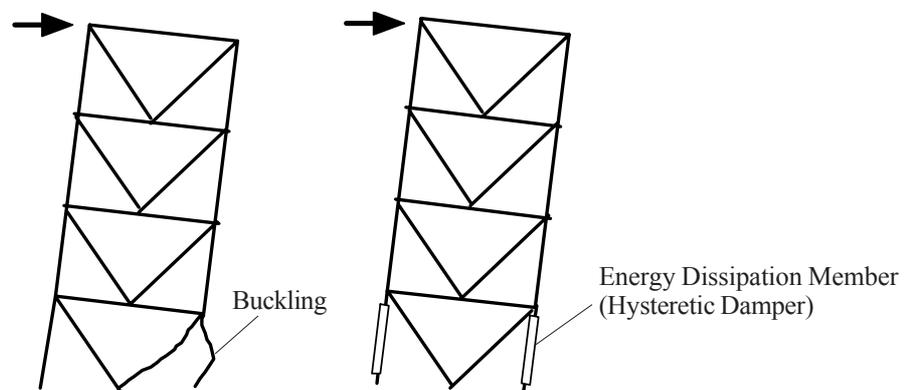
Damage Tolerant Concept for Truss Frame
